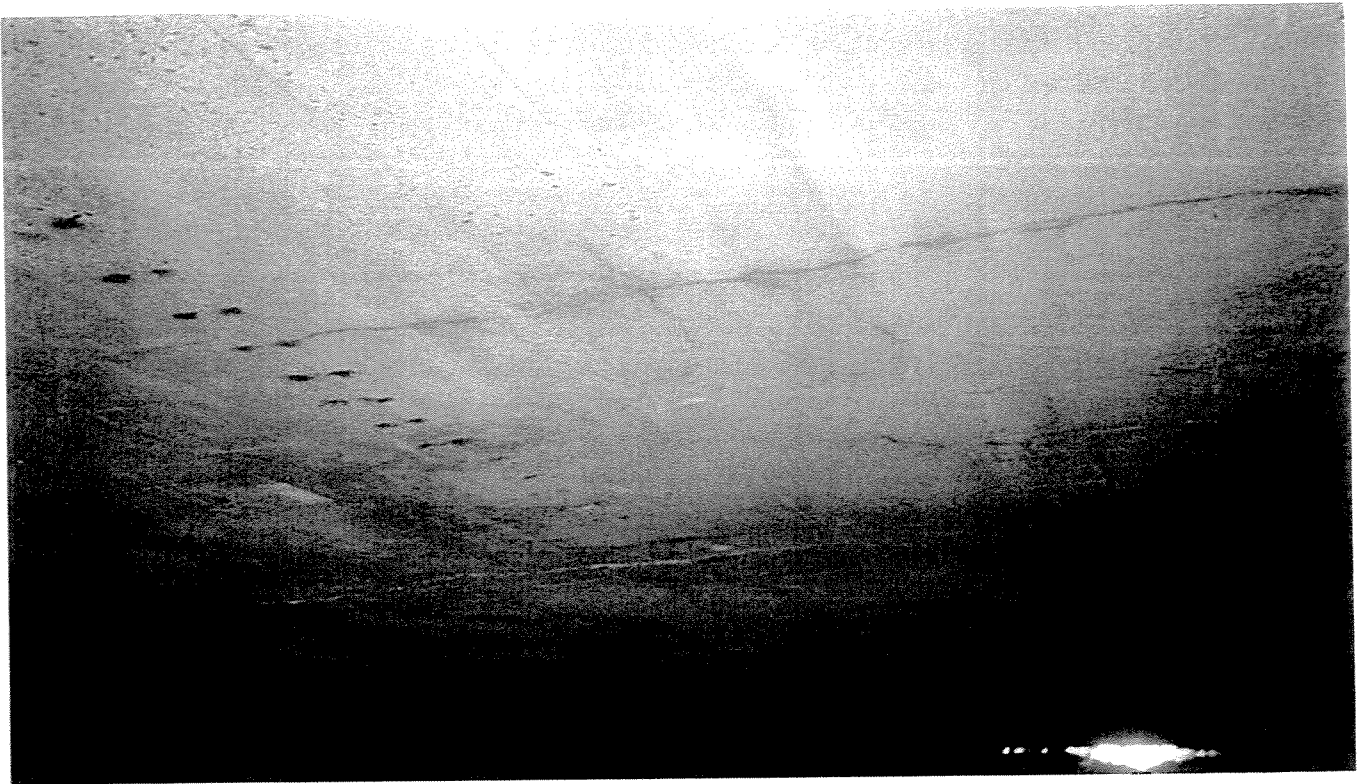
Between pile bents 78 and 77 at north side of pier. General view of typical underside of concrete deck in satisfactory condition with several longitudinal cracks, looking SE.
